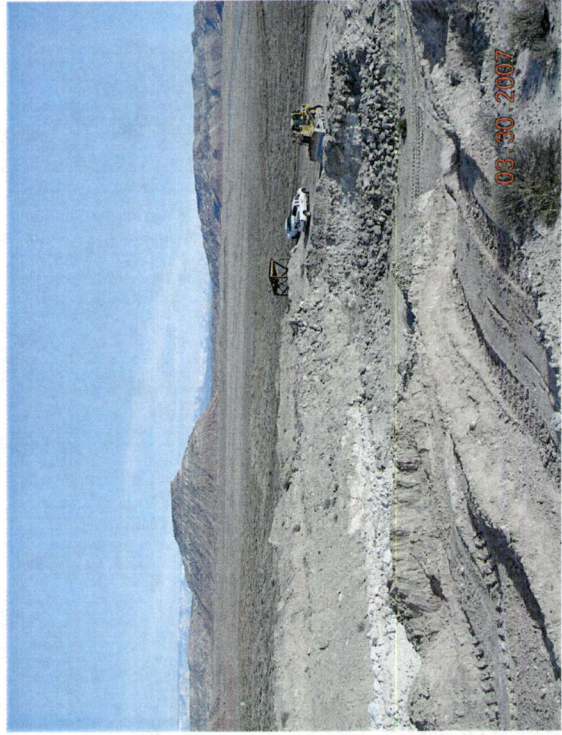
The mine pit is on the center right of the photo and is close to a county road.
